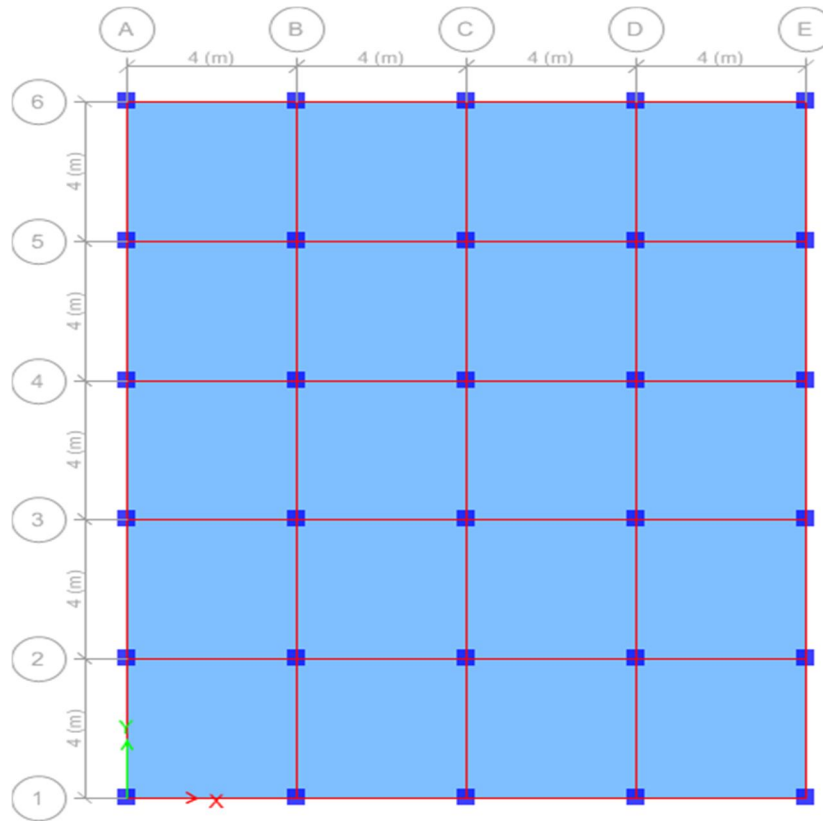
Regular Rectangular Shape (A-1) Plan View
